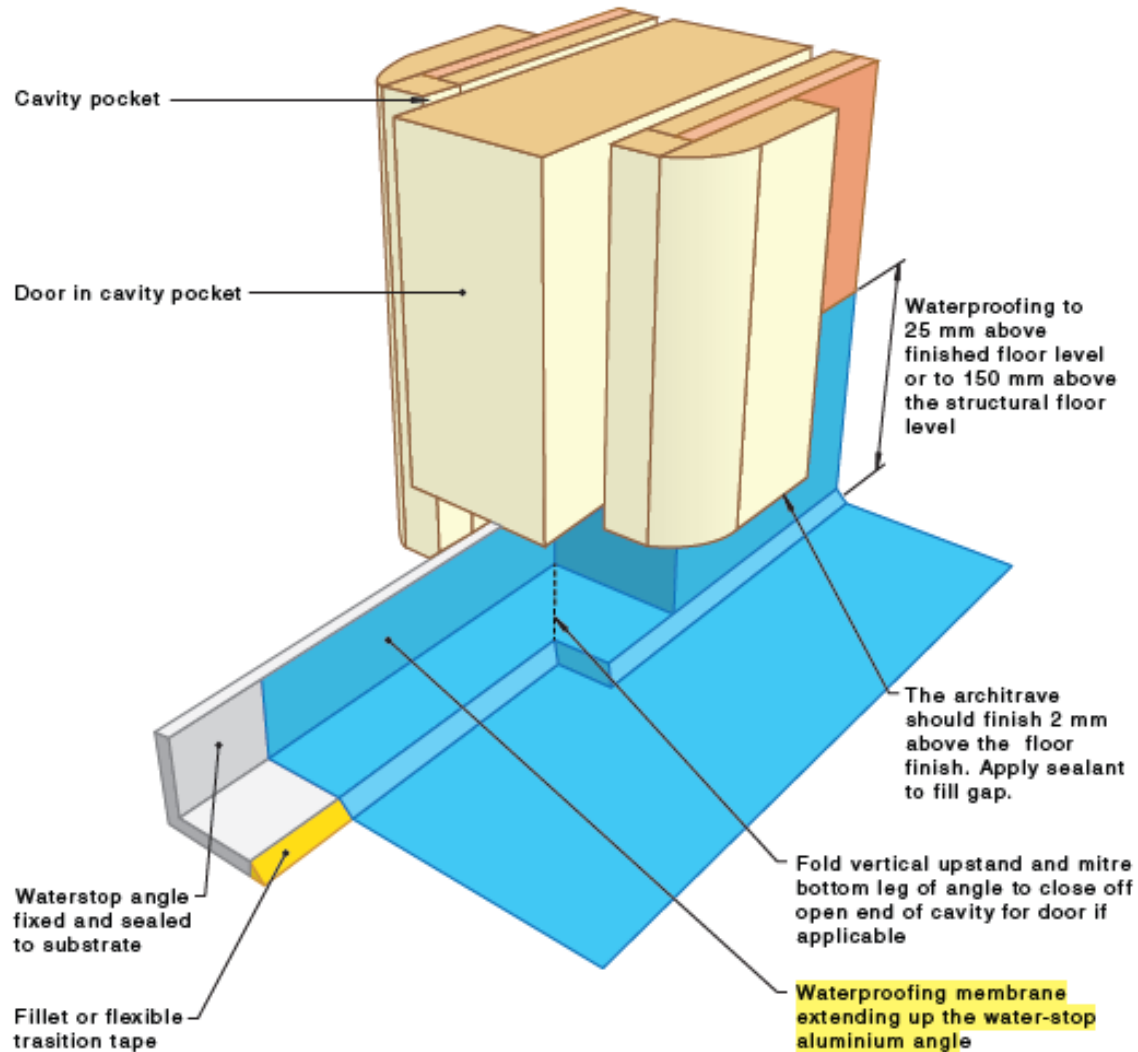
(B) — Waterproofing at door opening cavity slider
